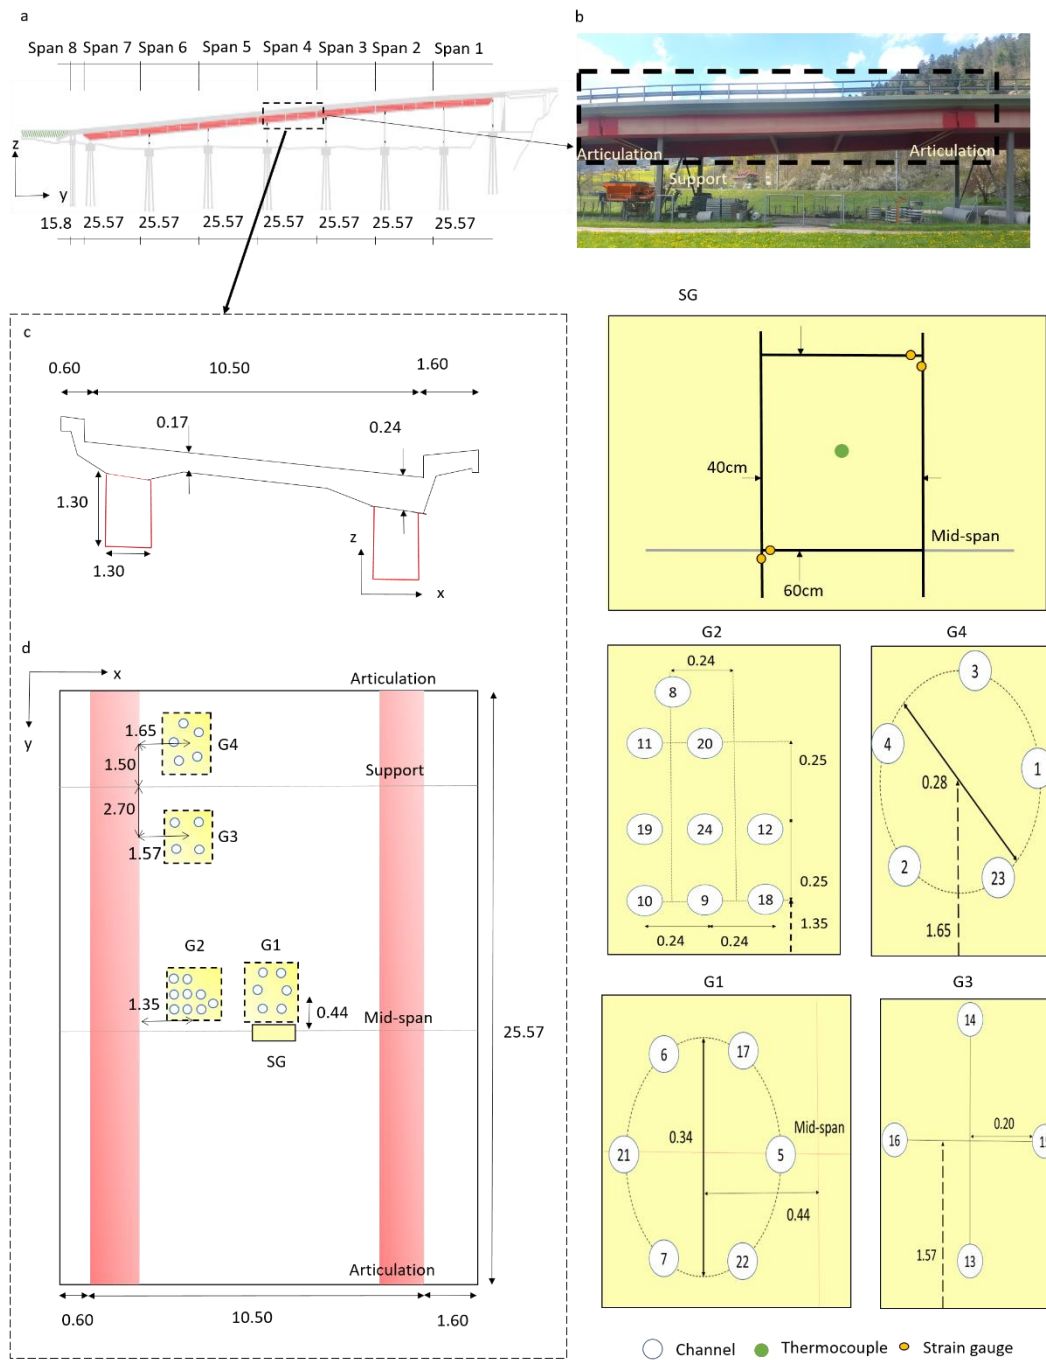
Presentation of the bridge and sensor deployment: elevation side (a); Span 4 (b); cross-section of Span 4 (c); bottom view of Span 4 (d); sensor deployment (SG, G1, G2, G3, and G4); dimensions in [m].
